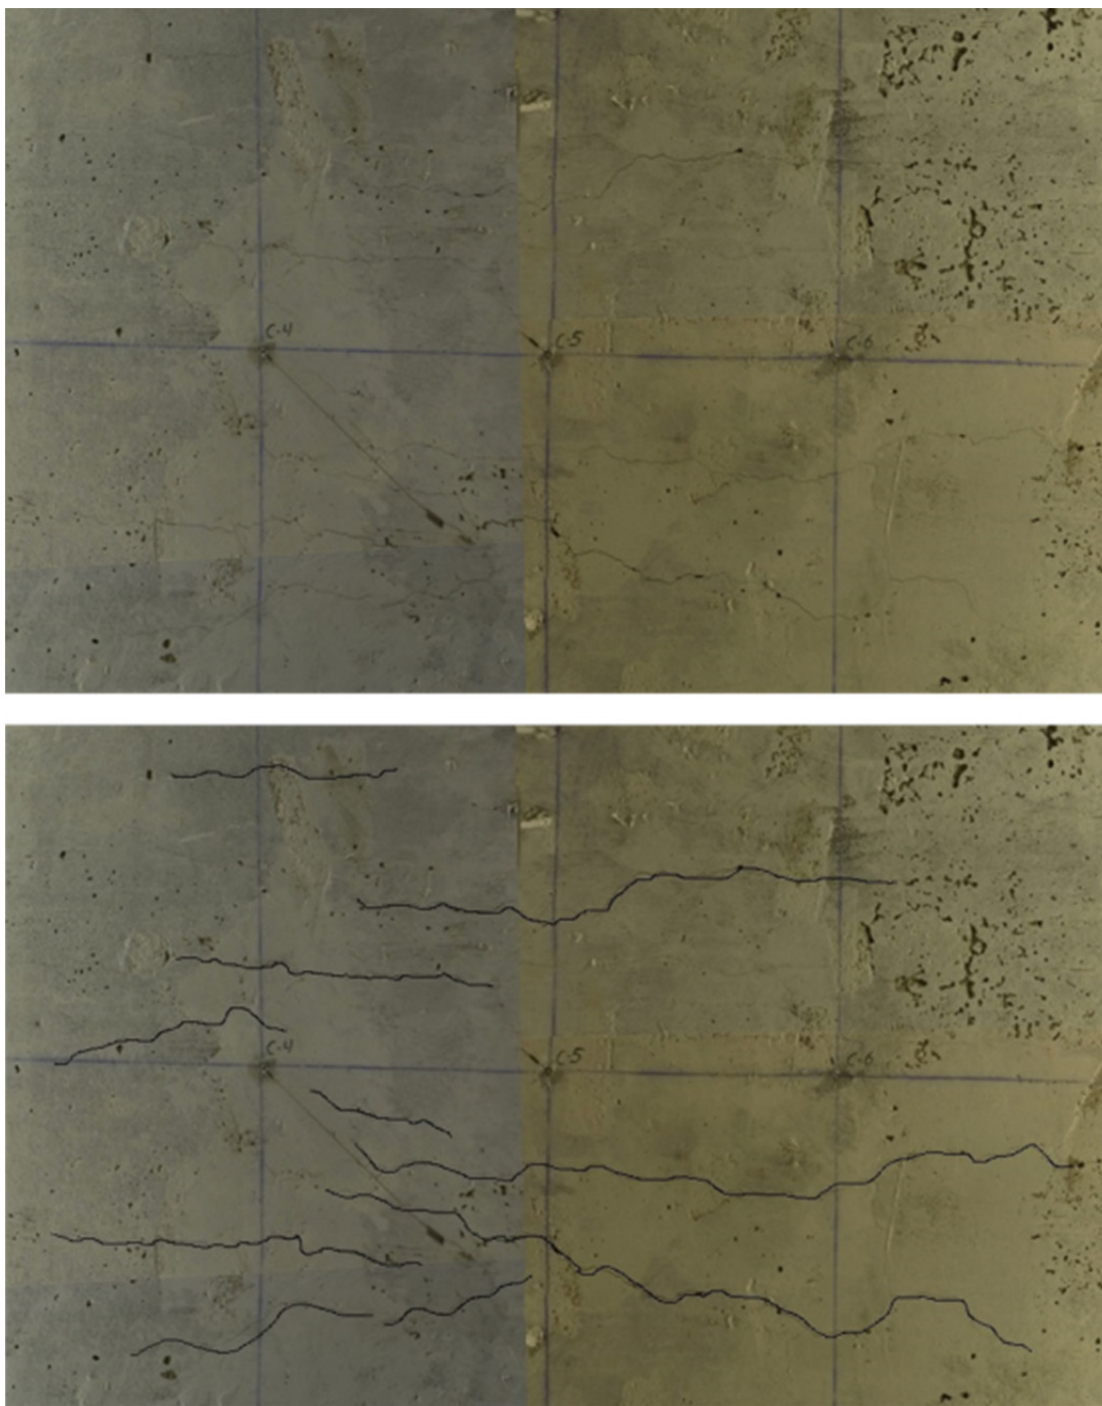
Minor flexural longitudinal cracks in the deck slab, i.e., bottom face of the inverted specimen, after all loading cycles. The horizontal line in the figure coincides with the box-girder centerline.
